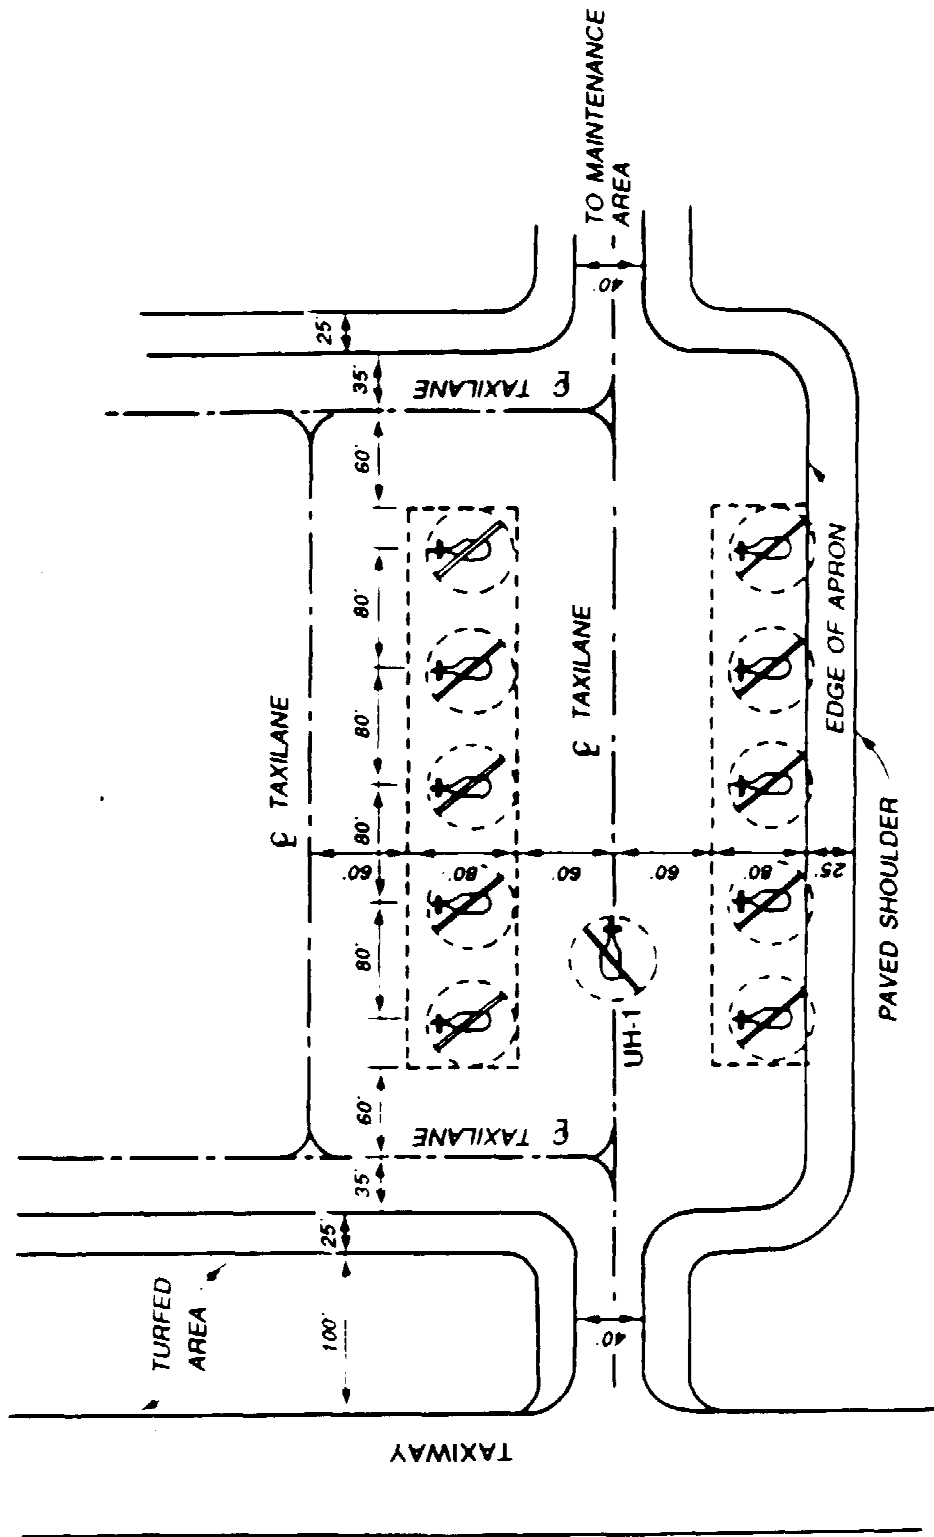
UH-1 Parking Plan, Type 1 (Single Lane)
